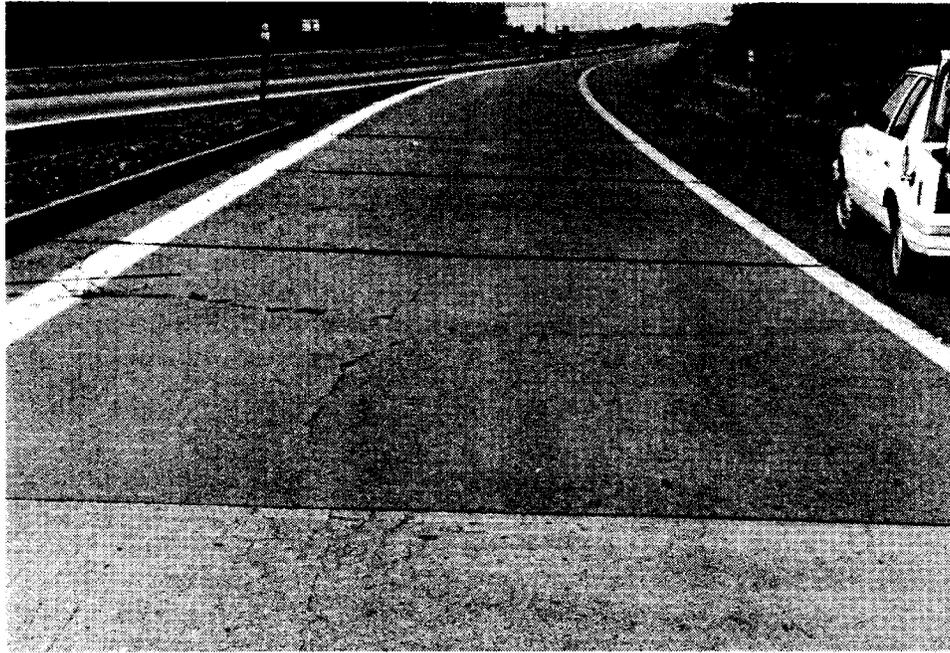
Severely cracked slab adjacent to expansion joints.
